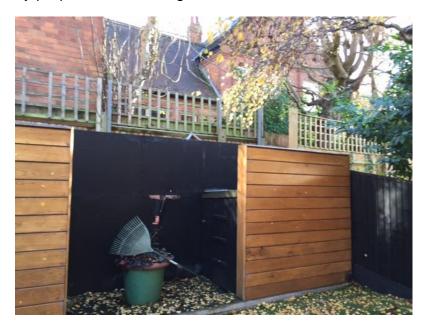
(above): Location of existing structure to rear of garden and existing rear fence
